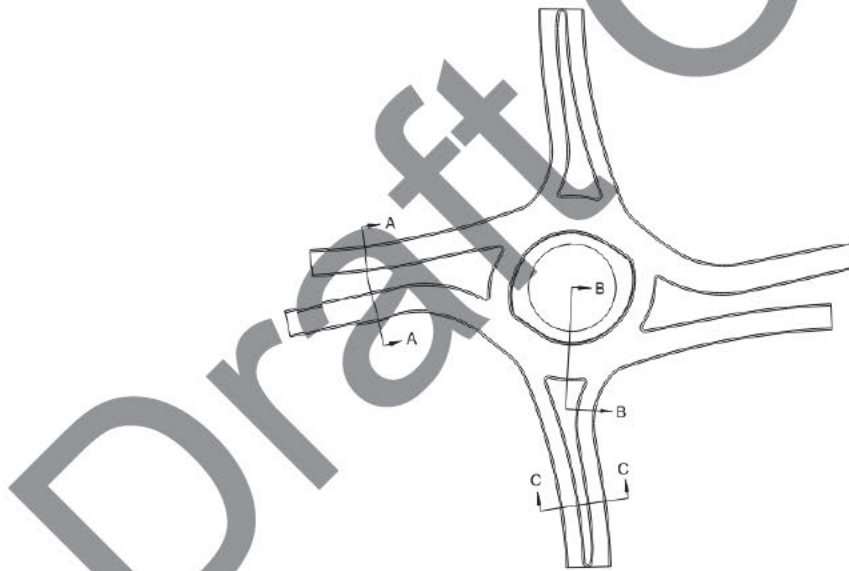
Roundabout 2x1 Proposed Typical Section Breakdown
